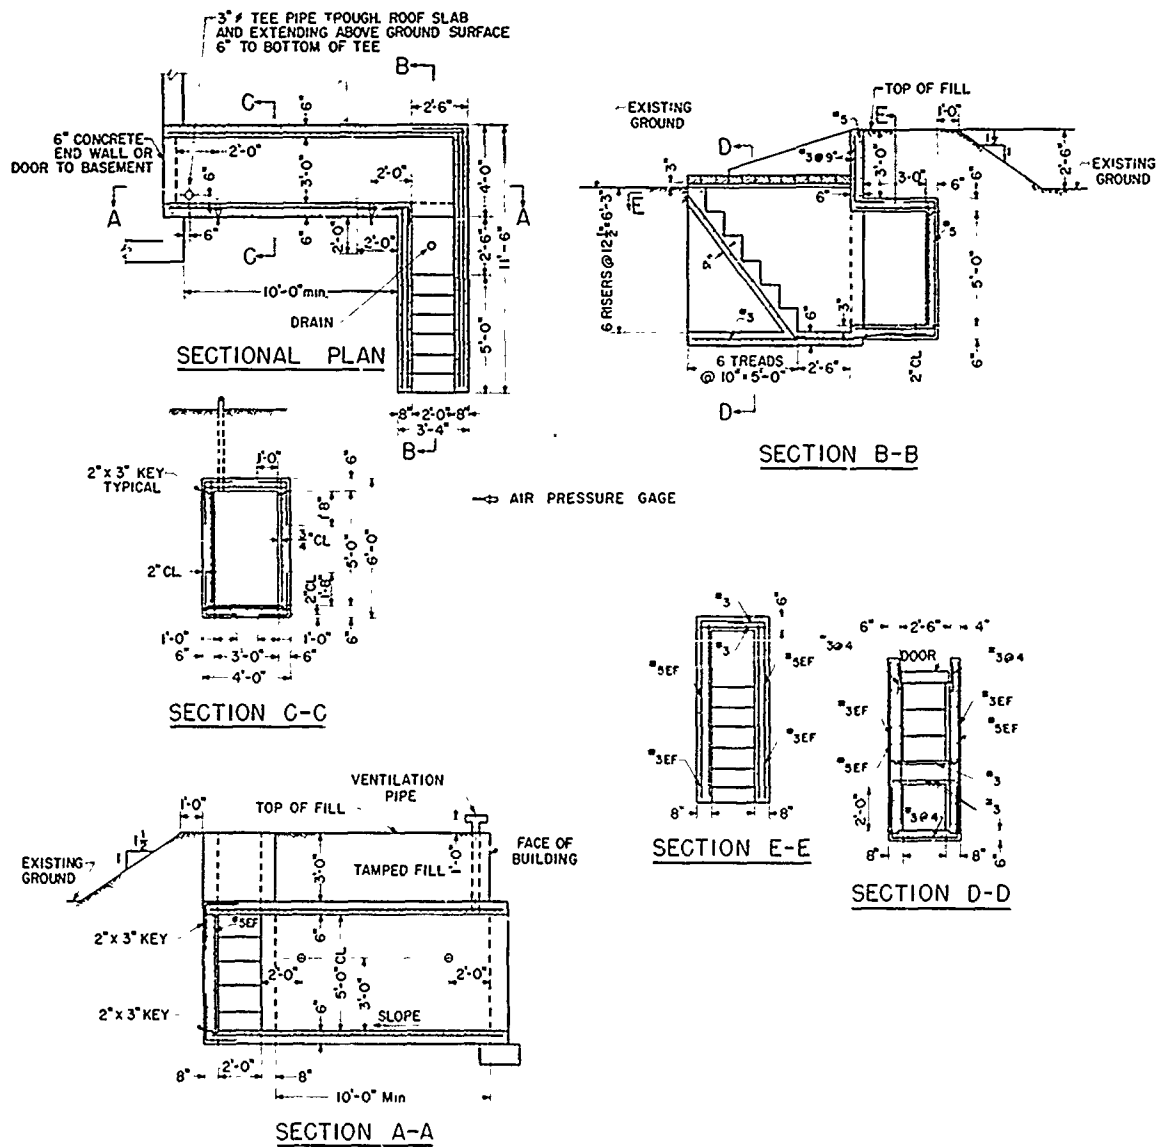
Details of basement exit shelter; Stations 4-34.1 b, 1-34.1 c, and 1-34.1 d.
